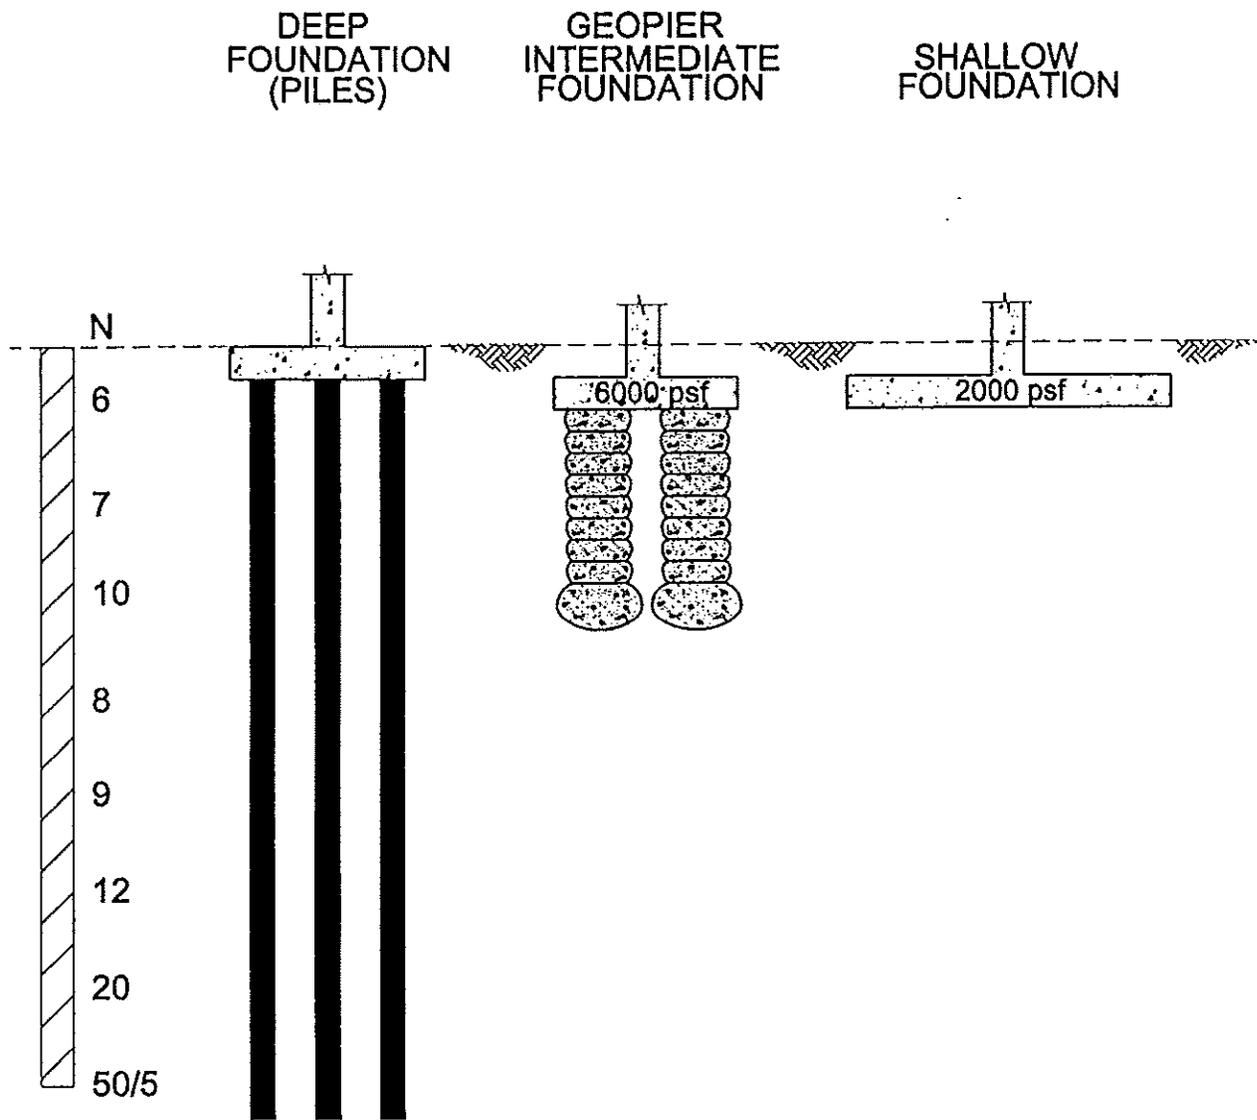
Foundation Alternatives in Weak Foundation Soils
